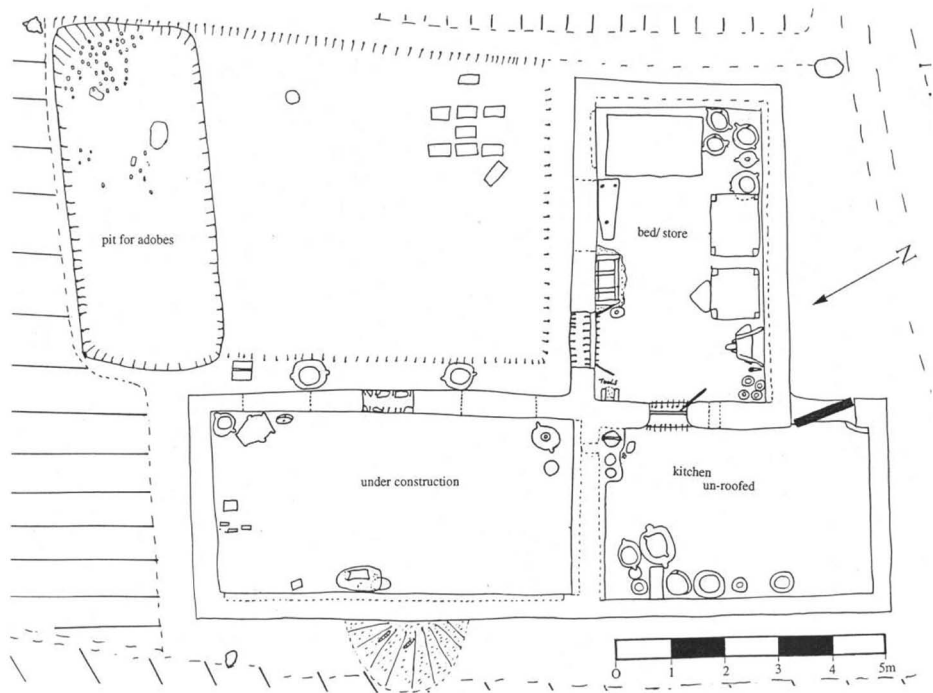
Plan of Maximo Amaru's house in 1985 while it was under construction. © Drawing: Bill Sillar.
